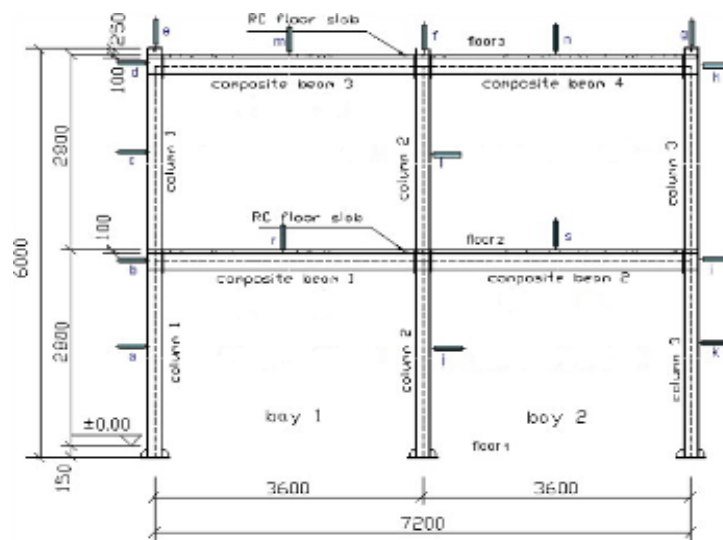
Elevation of the tested two-story two-bay portal frame [Hsu and Lin, 2006].
